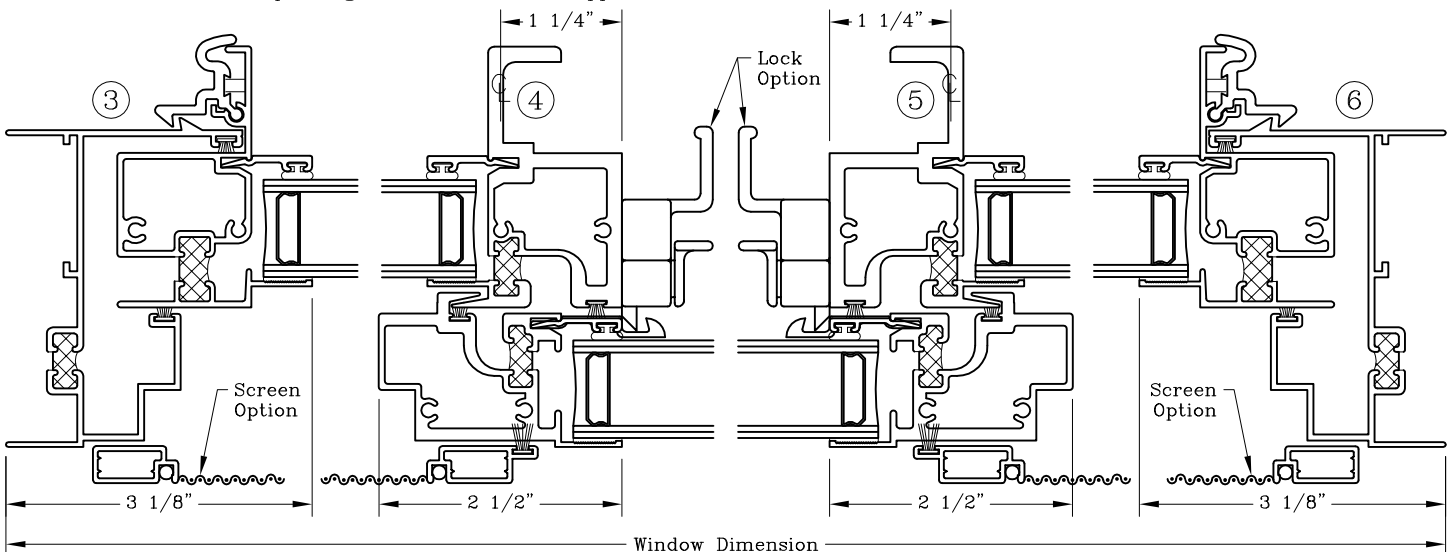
/2 Scale – For Custom Size Drawing Contact Graham
